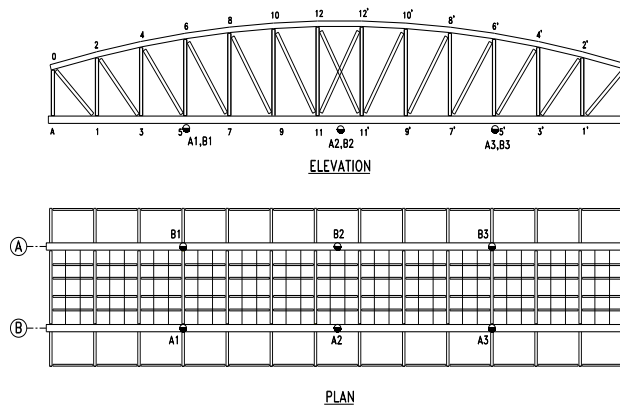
Imbaba Railway Bridge static testing plan layout for deflection locations.
